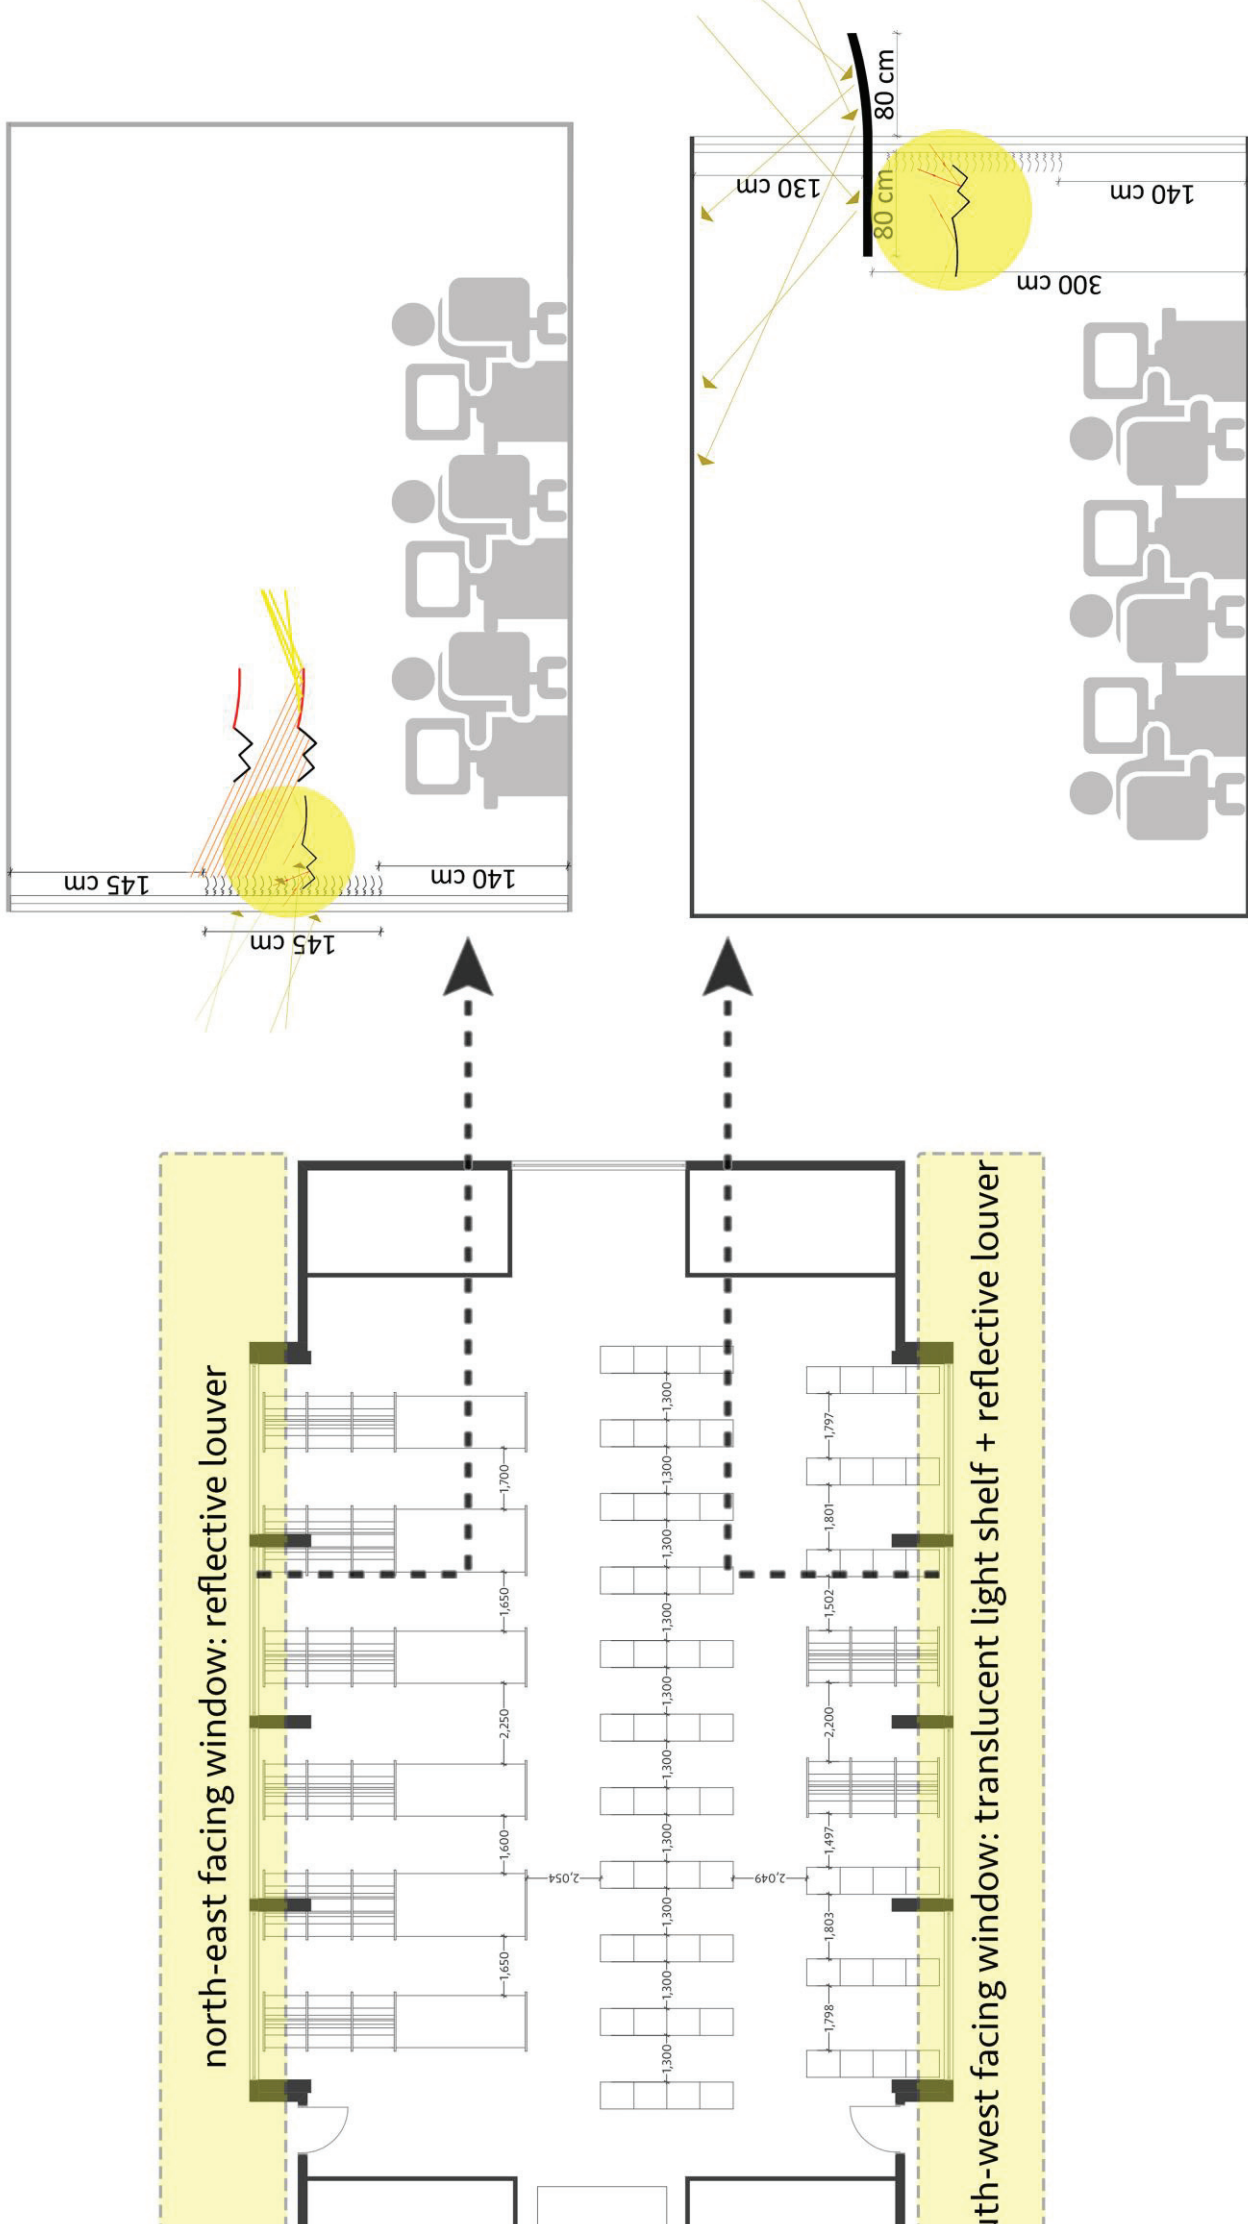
Daylighting strategy on the plan layout and the cross sectional views showing its shape and principle.
